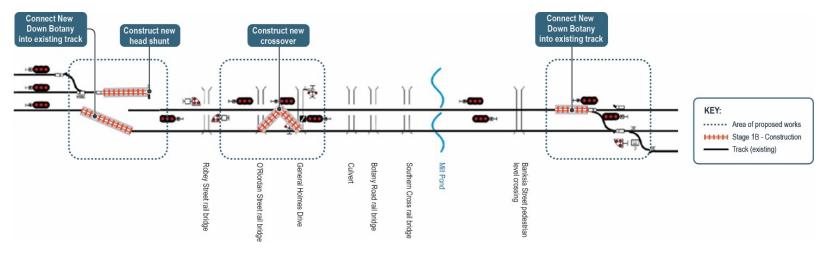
Indicative construction staging – Stage 1B: Cut over and head shunt
